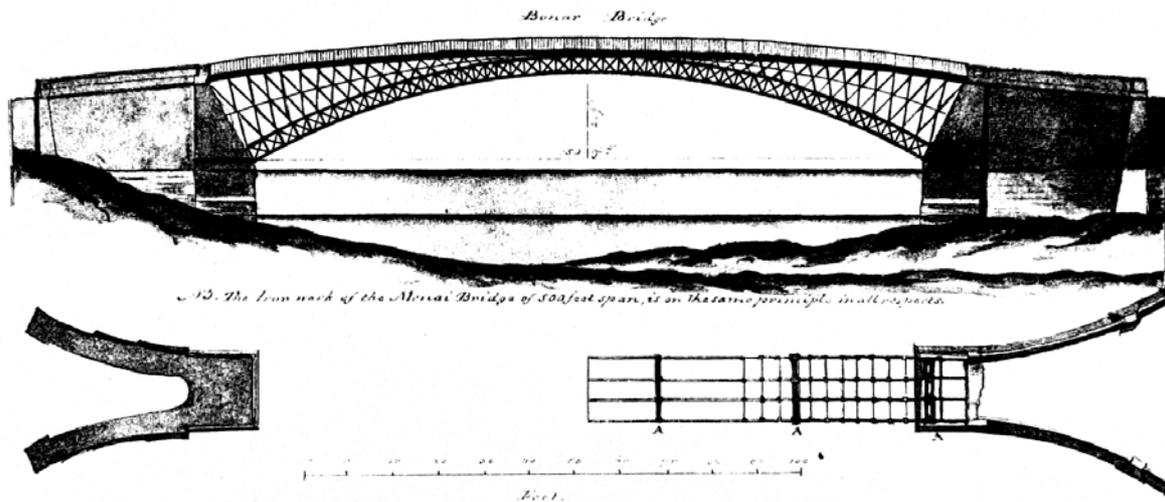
Cast-iron arch type bridge as proposed by Telford to cross the Menai Strait, 1811. (Telford²)
